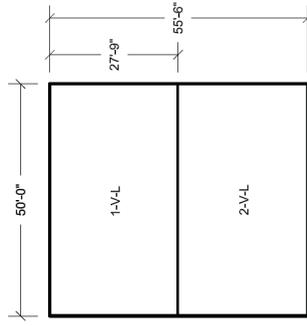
H.6-118. COOLING TOWER WEST WALL LOOKING EAST
